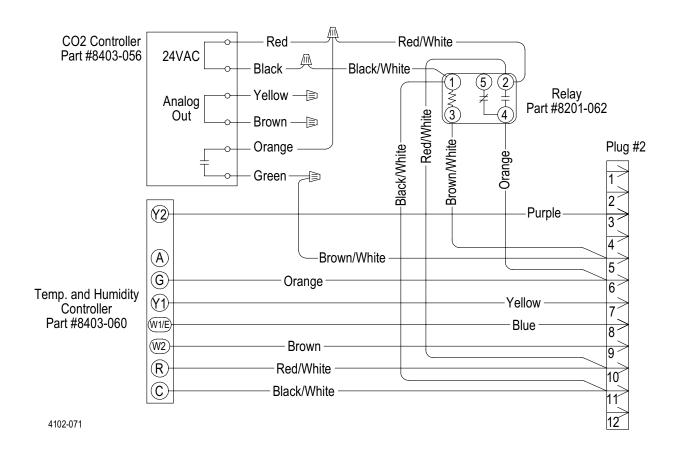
UNIT MOUNTED THERMOSTAT WIRING DIAGRAM "D" THERMOSTAT OPTION
